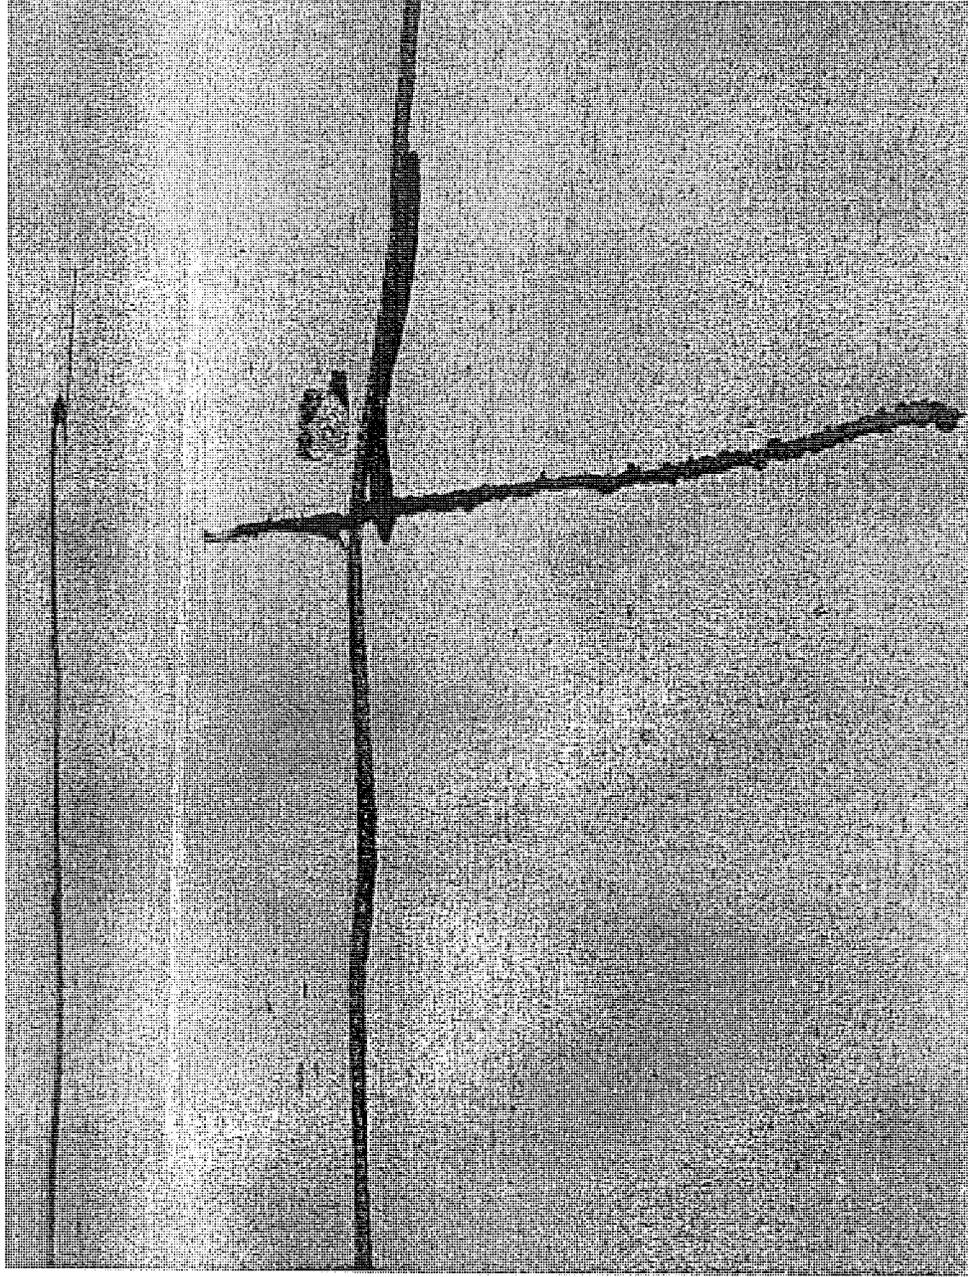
Reflective joint cracking on M-50, Control Section 46082 Job Number 30388 BMP 3.9 EMP 4.4
